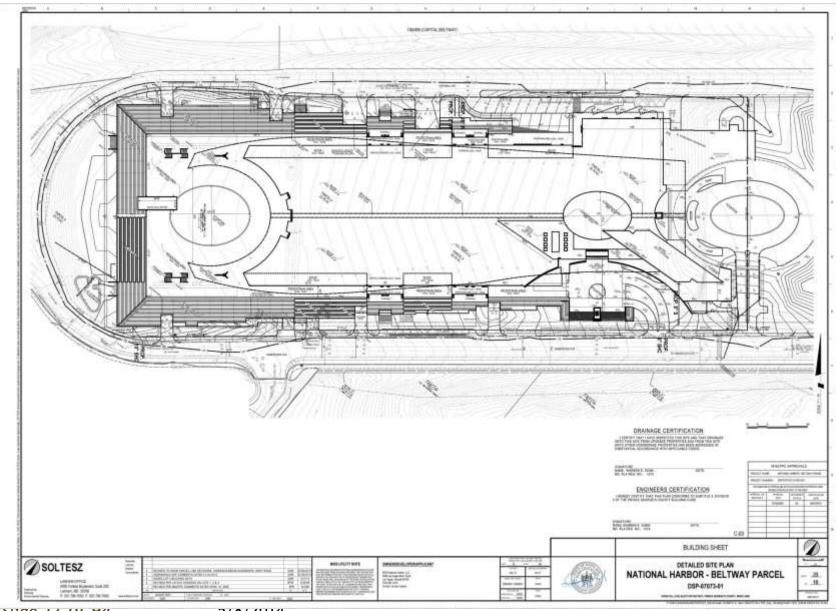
DETAILED SITE PLAN SET (PAGE 1 OF 10)
